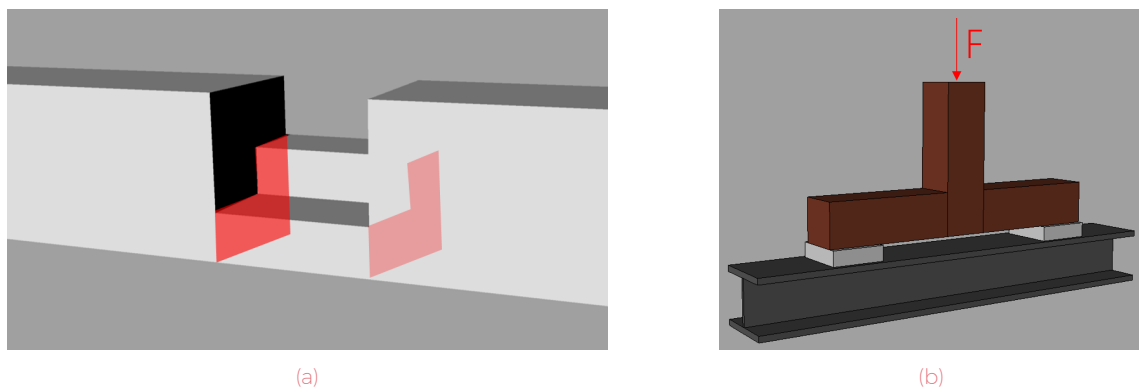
Critical planes for bending failure of Beam 2 (18.5a) and setup test 3 (18.5b)
